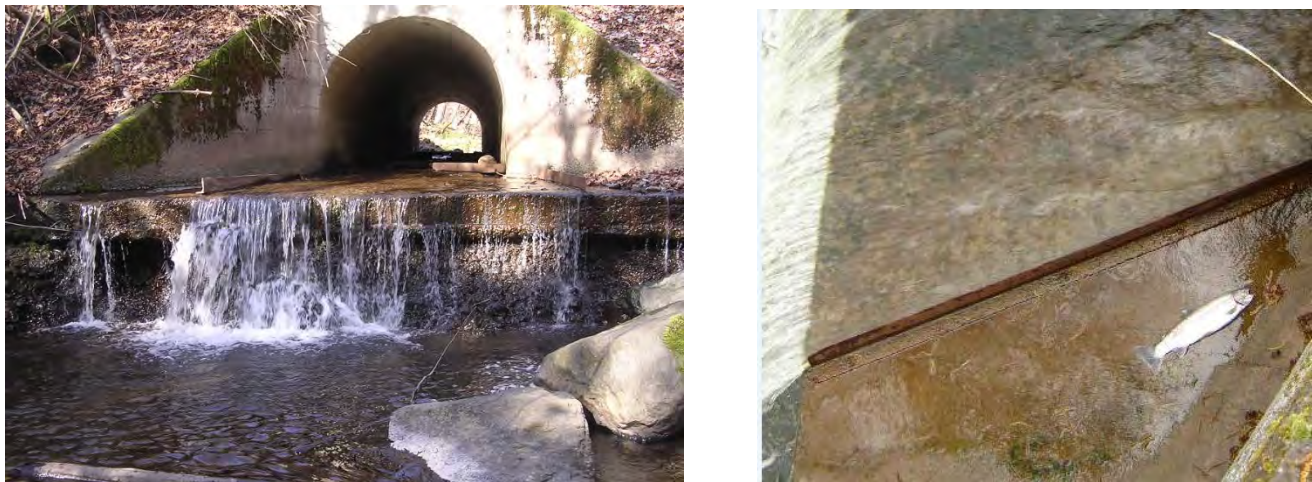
Photos of the railroad culvert near the mouth of Jones Creek (left) and an adult summer steelhead that died attempting to pass the culvert (right). Right photo credit: Mike Cooley, Middle Rogue Steelheaders.
